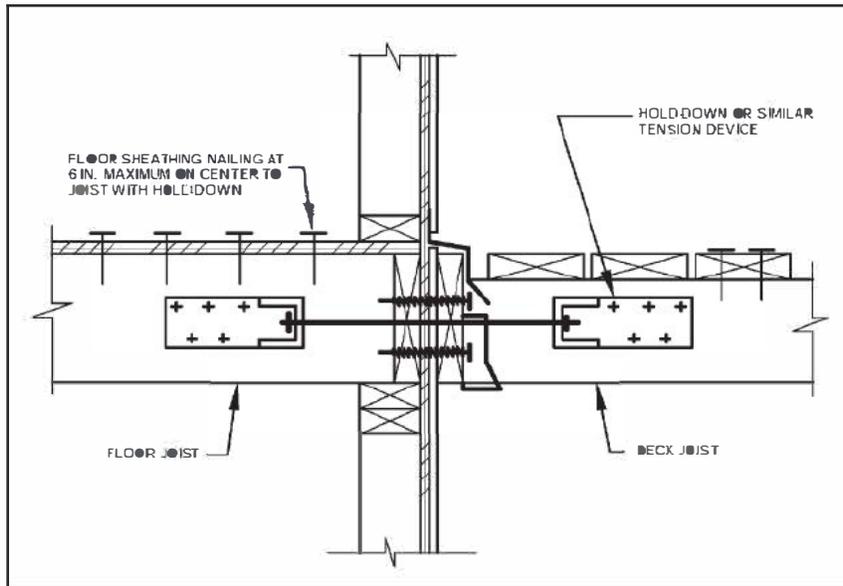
ATTACHMENT OF LEDGER BOARD-TO-BAND BOARD with hold down tension devices
